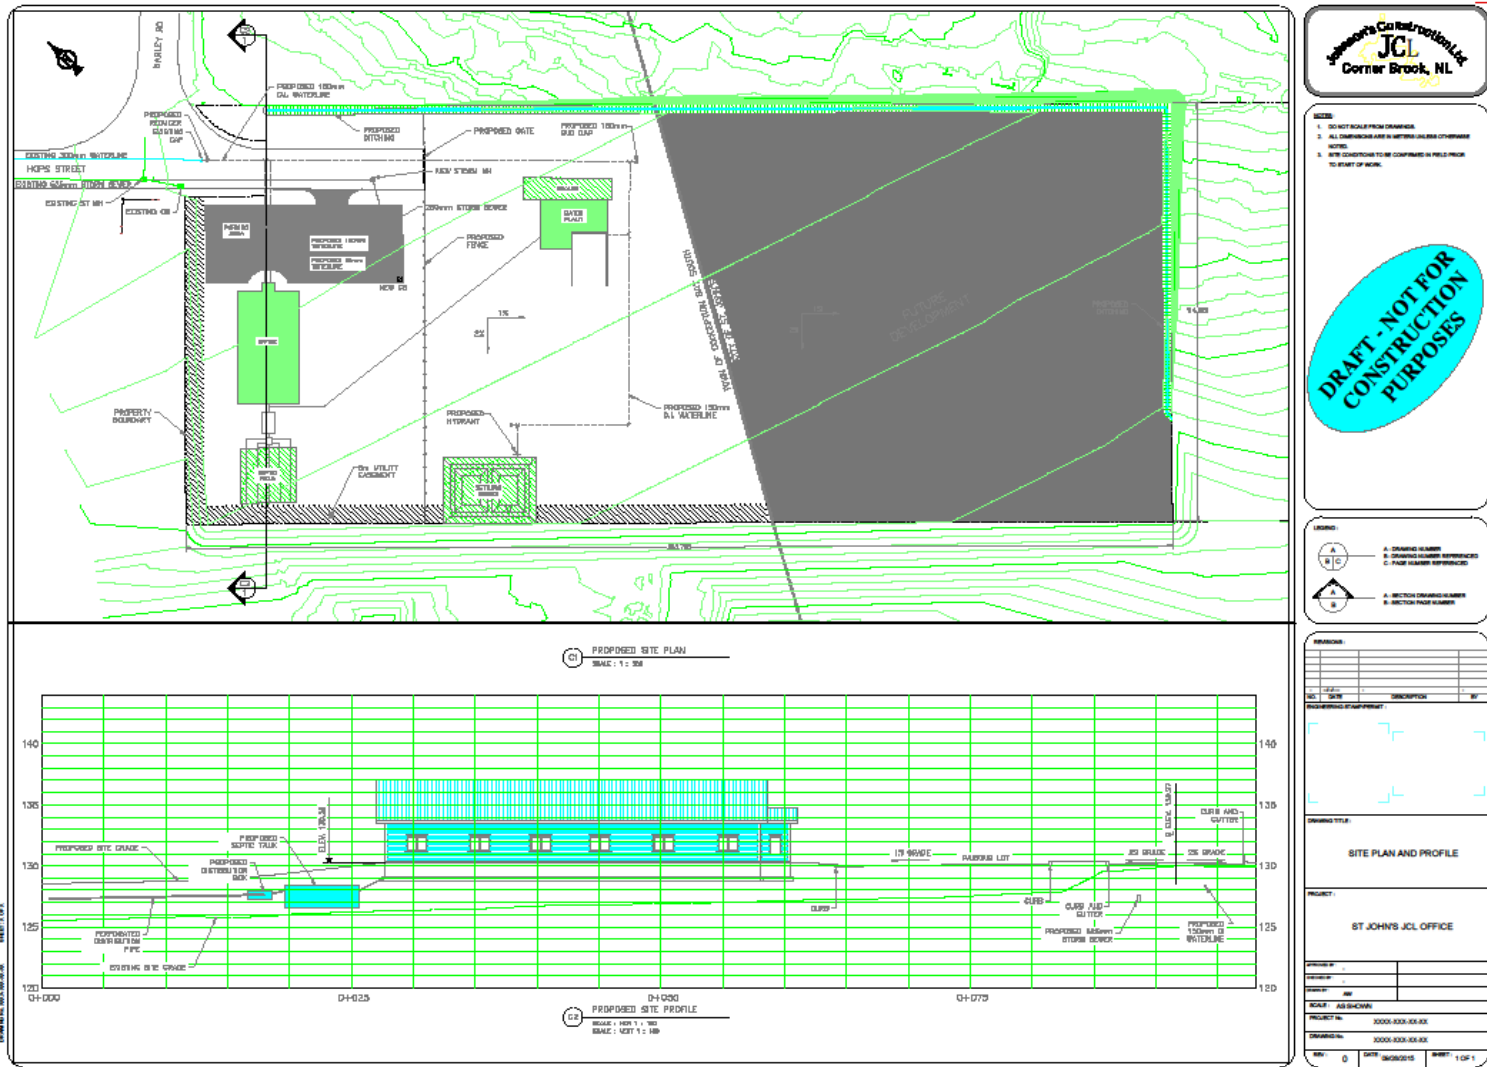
Detailed Site Plan of Office Building and Concrete Operation
